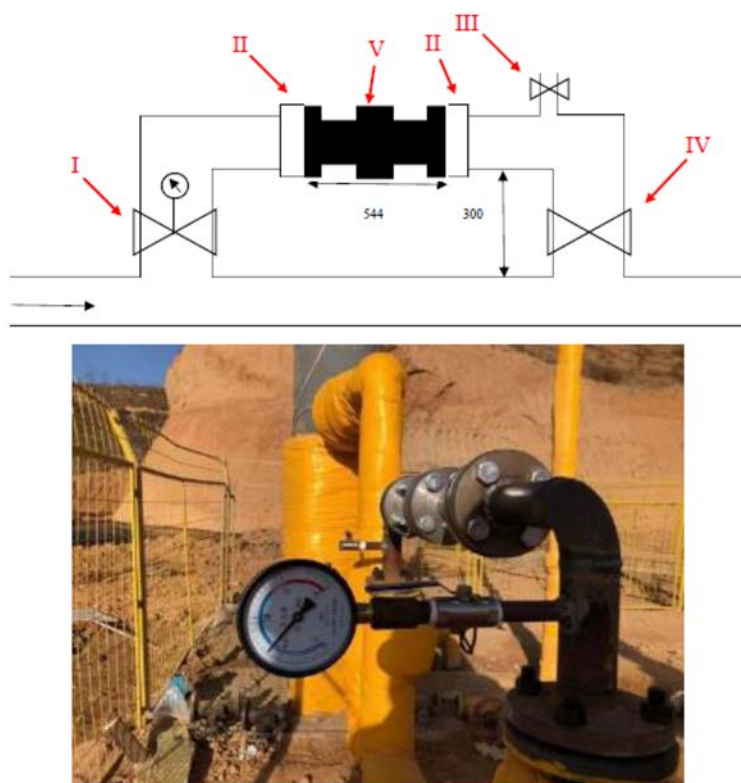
Bypass line diagram I - valve with pressure gauge, II - flange, III - ball valve, IV - valve without pressure gauge, V - filtration device
